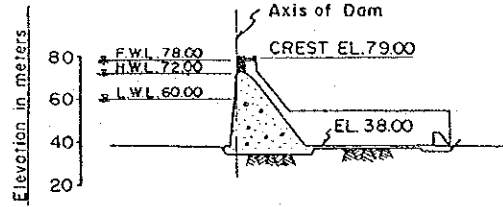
LAYOUT PLAN OF DUMMON DAM
